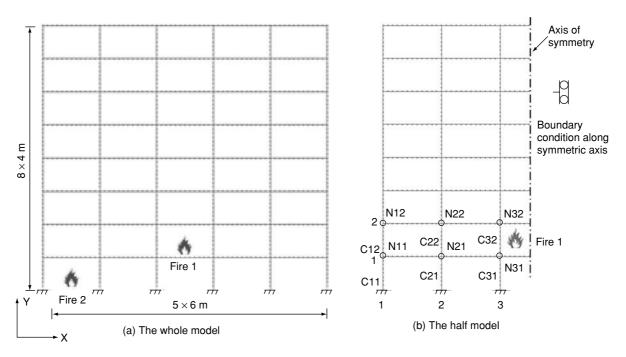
Schematic of the steel frame exposed to fire modelled in OpenSees
